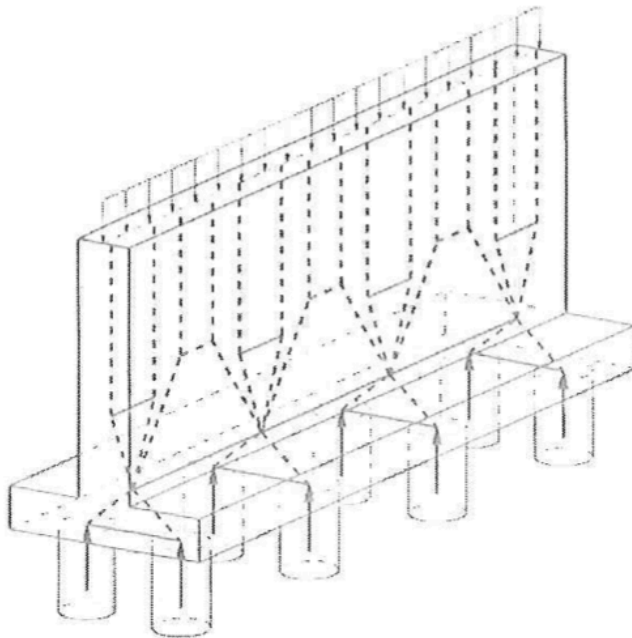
Distribution charges from Wall to slab foundation and piles
